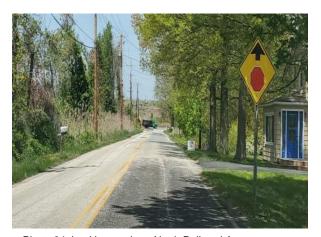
Looking north on North Railroad Avenue (CR 602), approximately 500 feet south of US Route 130
